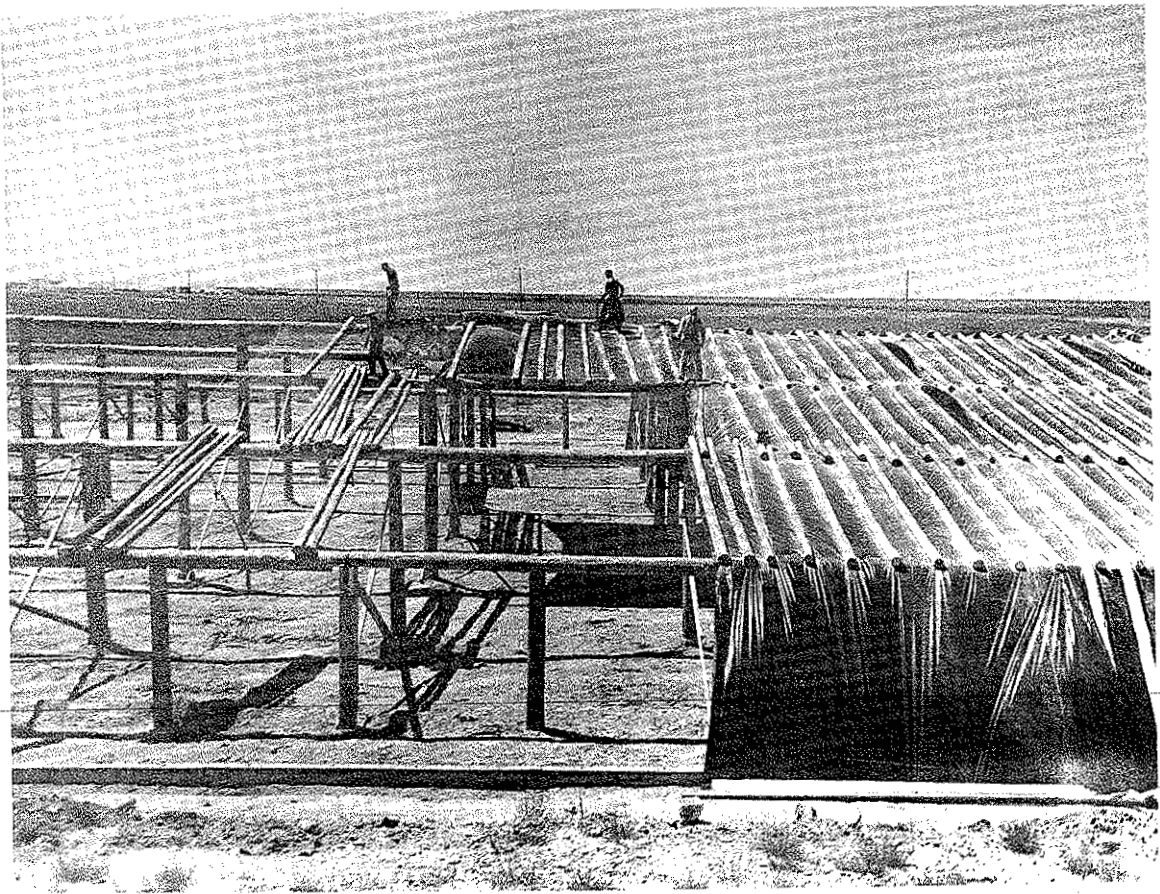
Construction view of Fig. 2 showing chicken wire and vapor barrier. Courtesy of U. P. Railroad.
